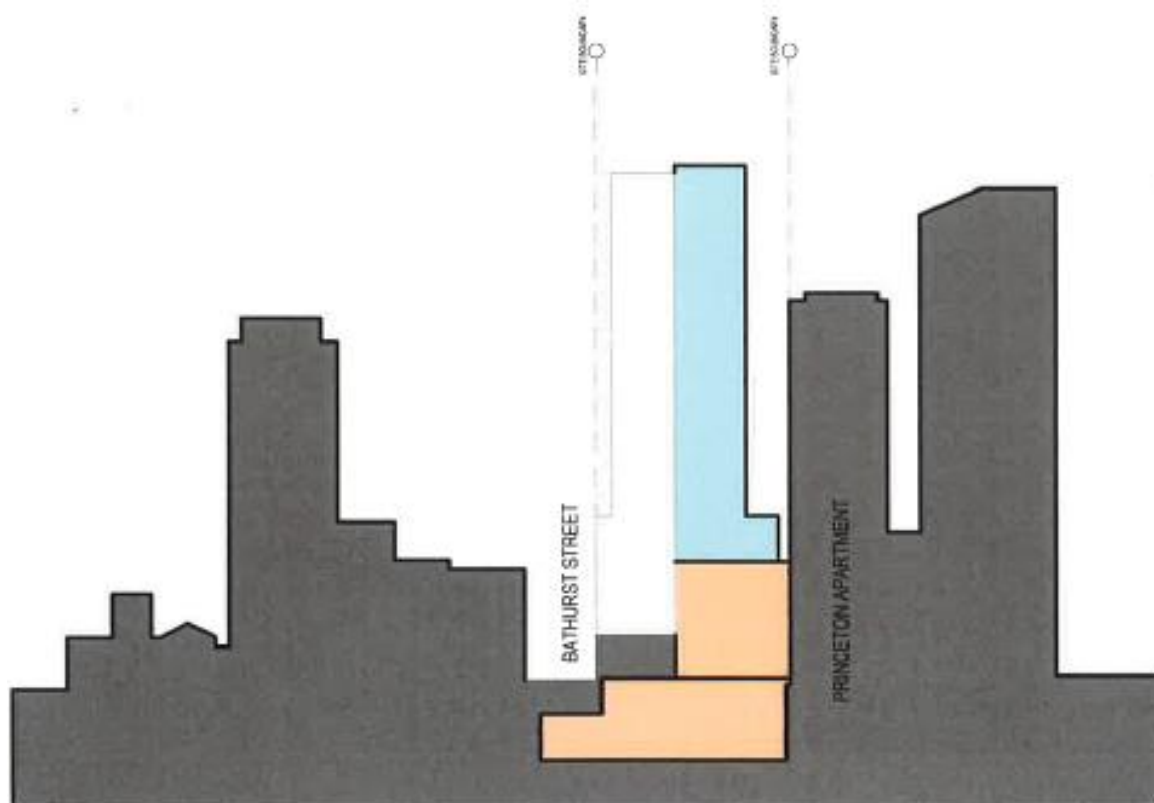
Pitt Street South Concept SSD DA – Building Section
